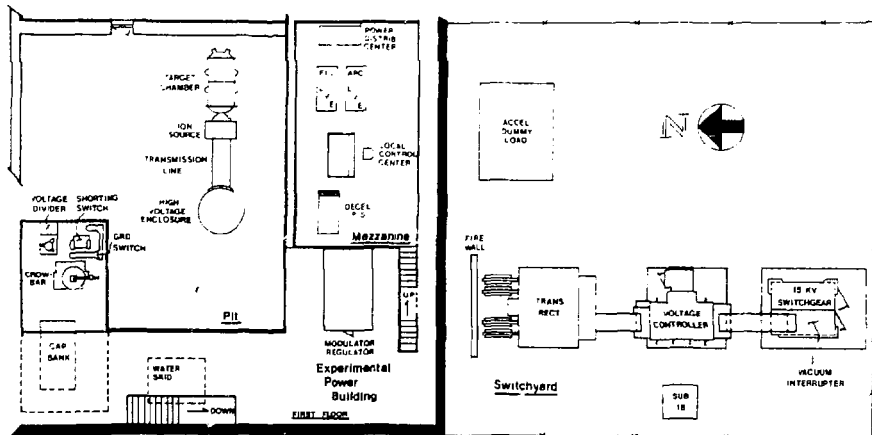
TFTR NEUTRAL BEAM TEST FACILITY
